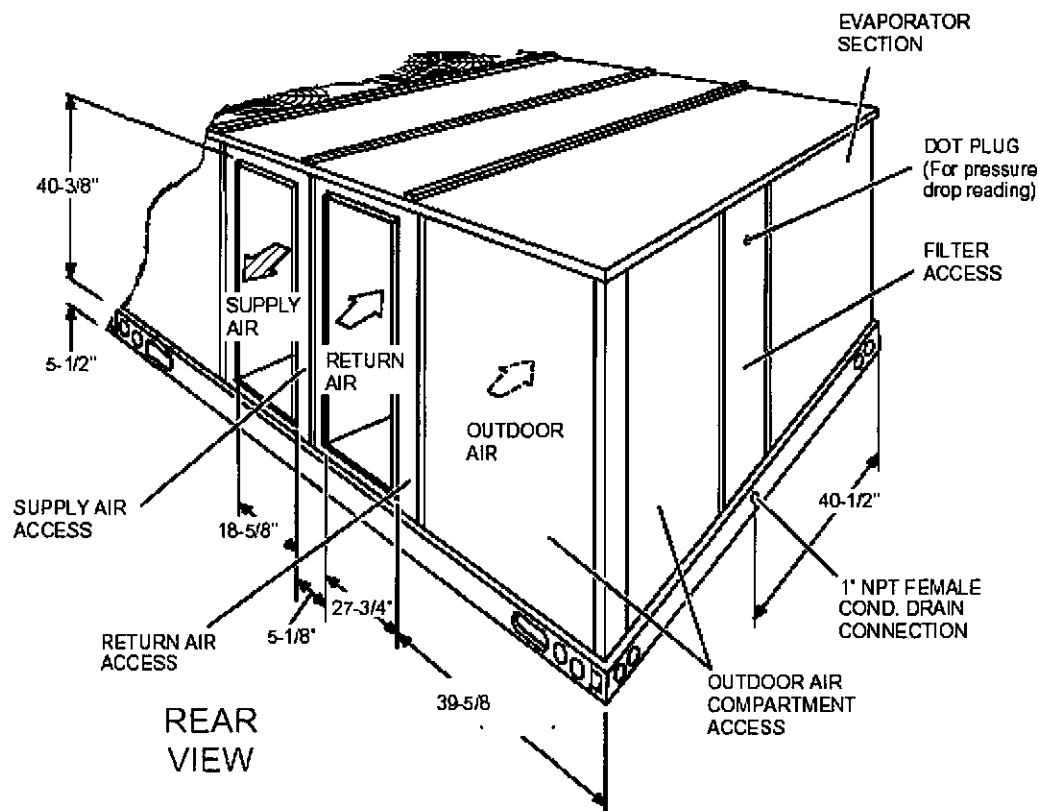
UNIT DIMENSIONS (REAR VIEW)
